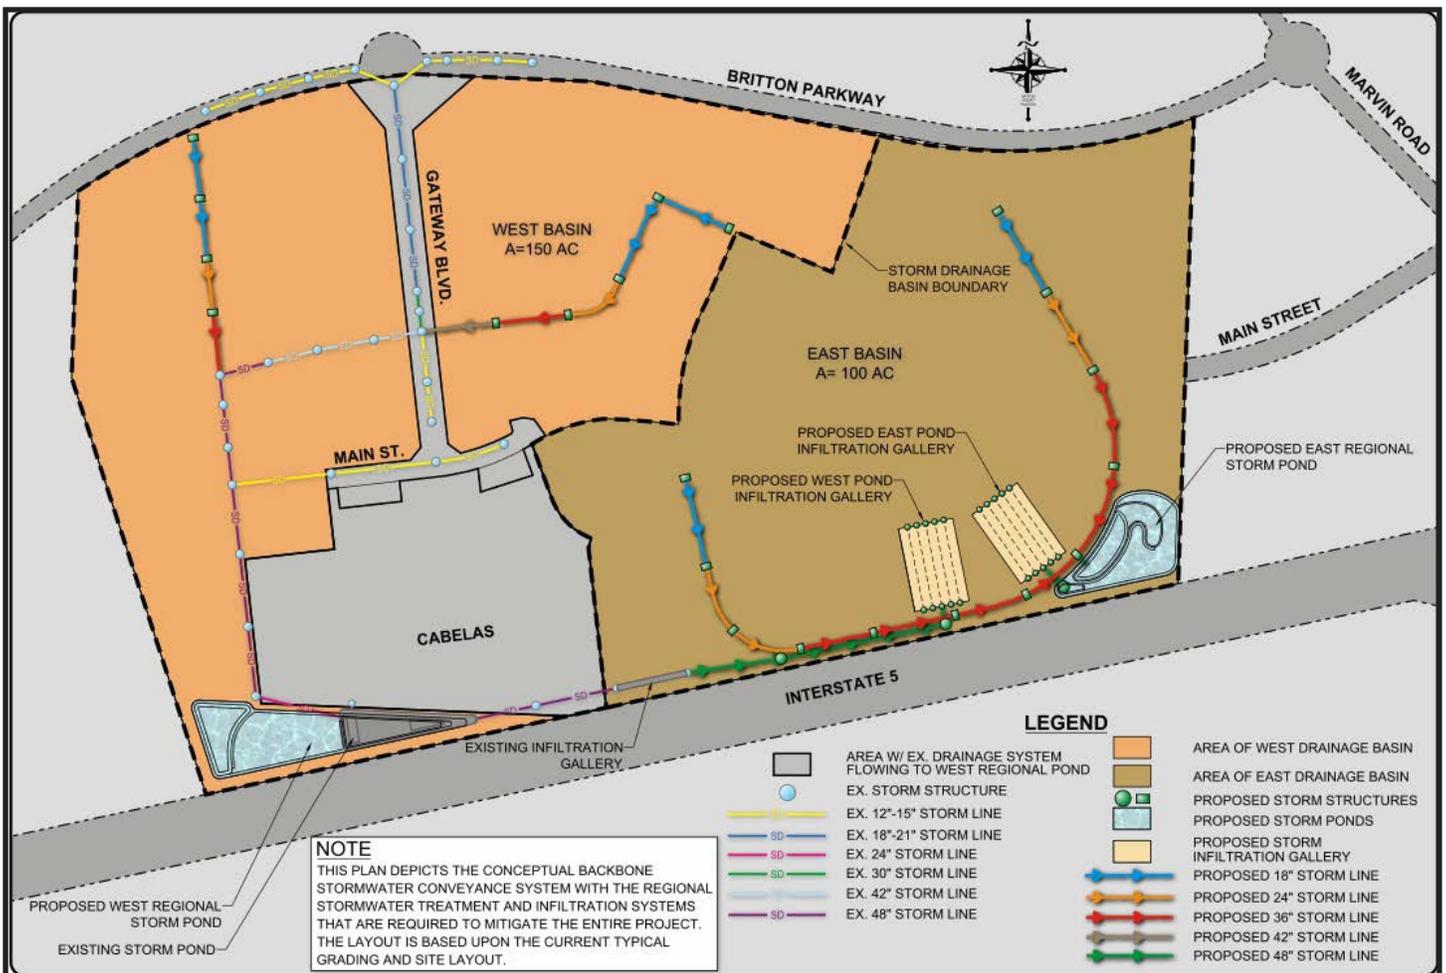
Proposed stormwater plan and drainage basins on the Lacey Gateway site
